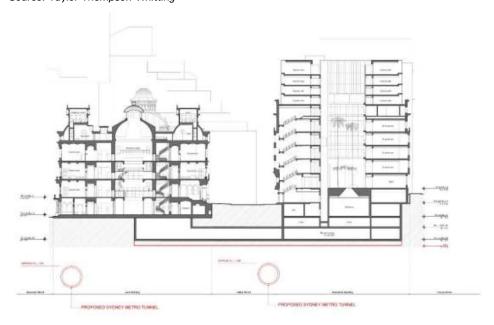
Sydney Metro Tunnel Cross Section *Source: Taylor Thompson Whitting
